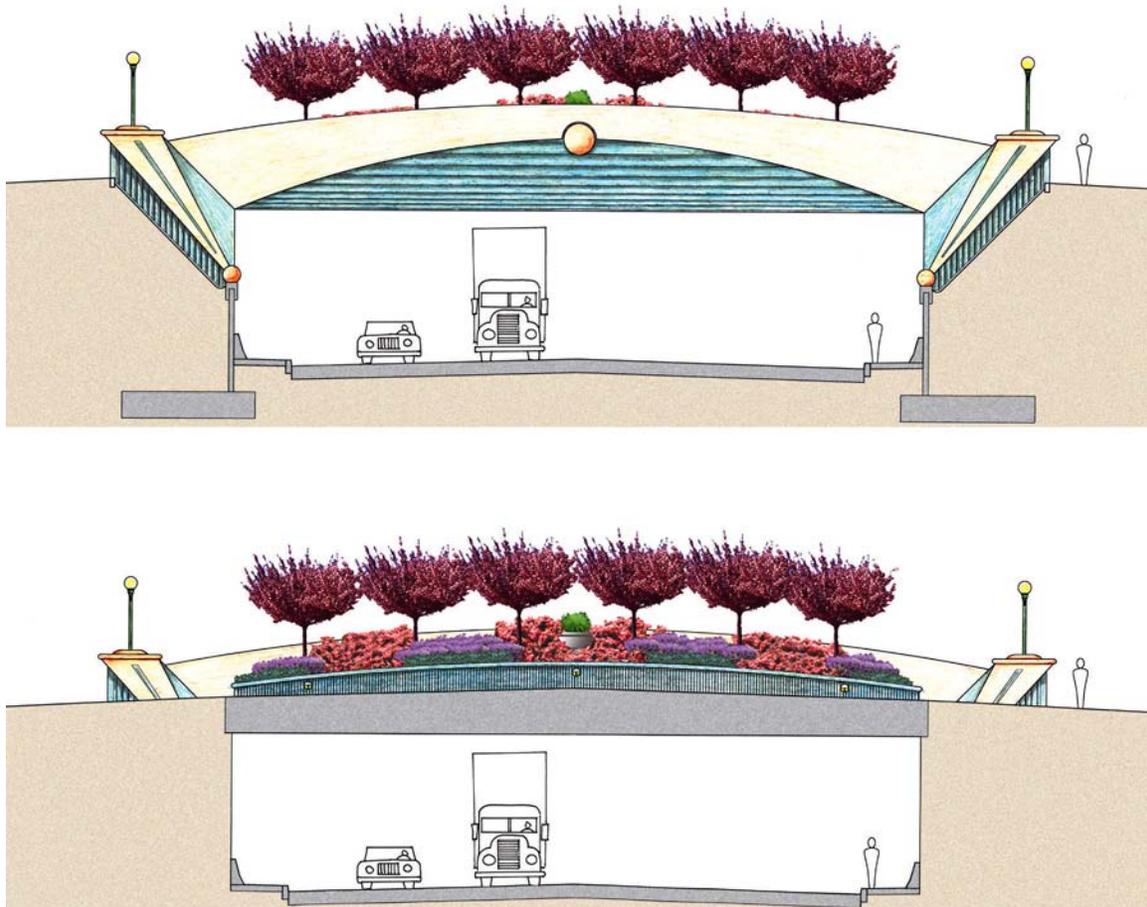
In this case the highway bridge becomes a “landscape” structure and features Art Deco detailing in concrete surfaces (above) elevation shows fascia beam and pylon ornamentation; (below) longitudinal section through center of deck shows built-in concrete landscape planters.
